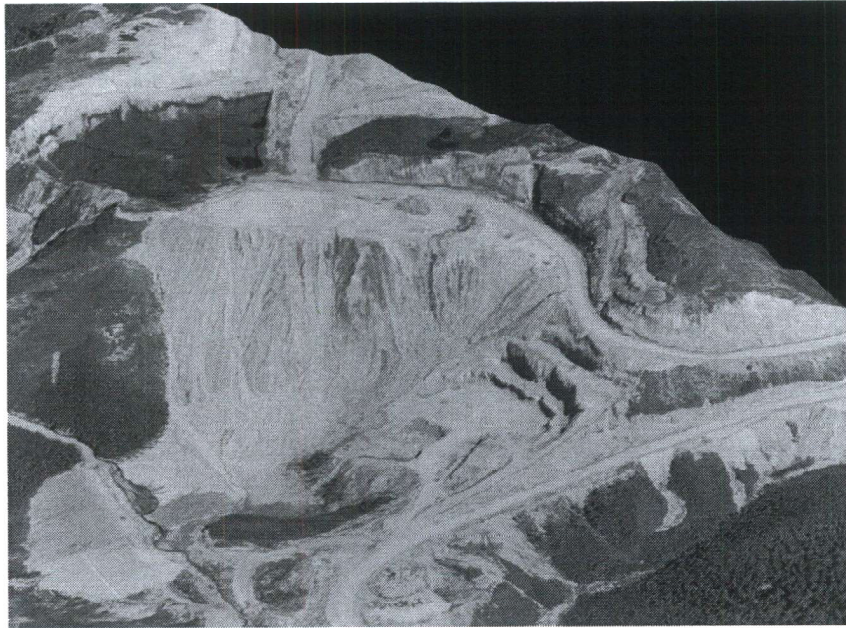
Aerial view of the existing Mt Frederick Sidecast
